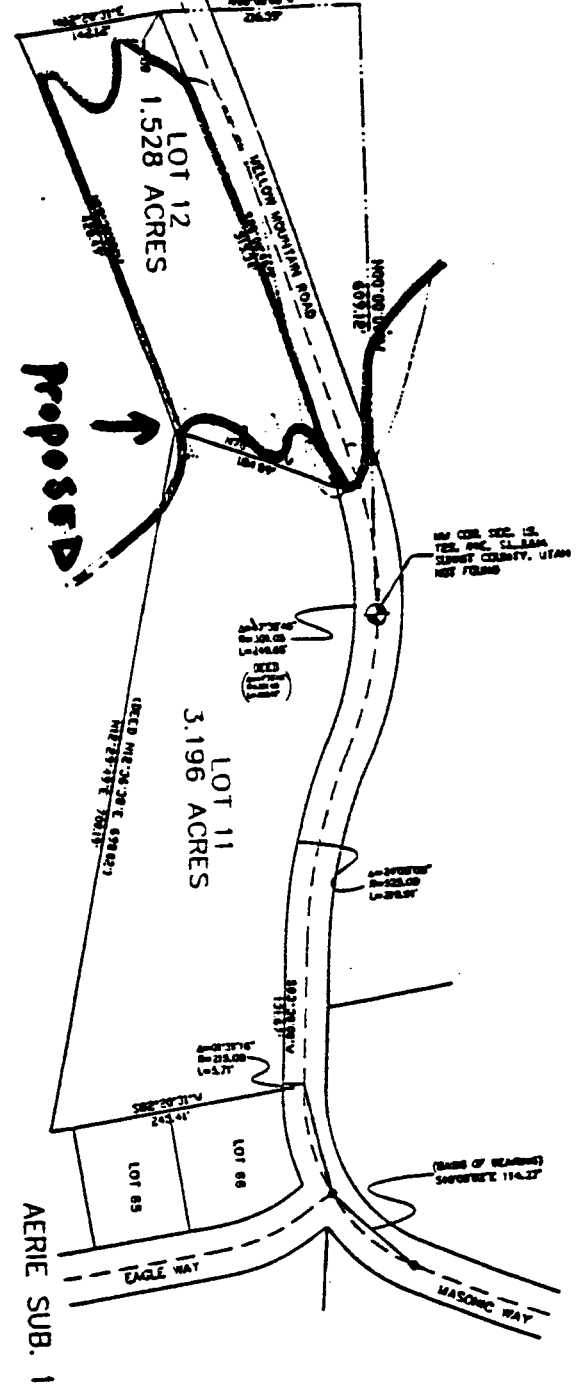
EXHIBIT A - PLAT AMENDMENT & PROPOSED TRAIL CONNECTION
